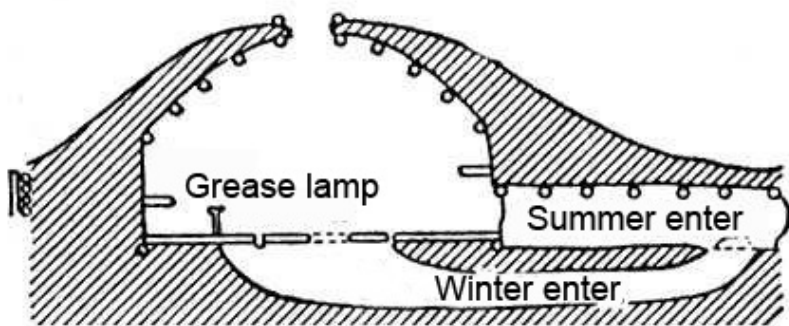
Cross-section showing how a dome-roofed half-pit house was set up
